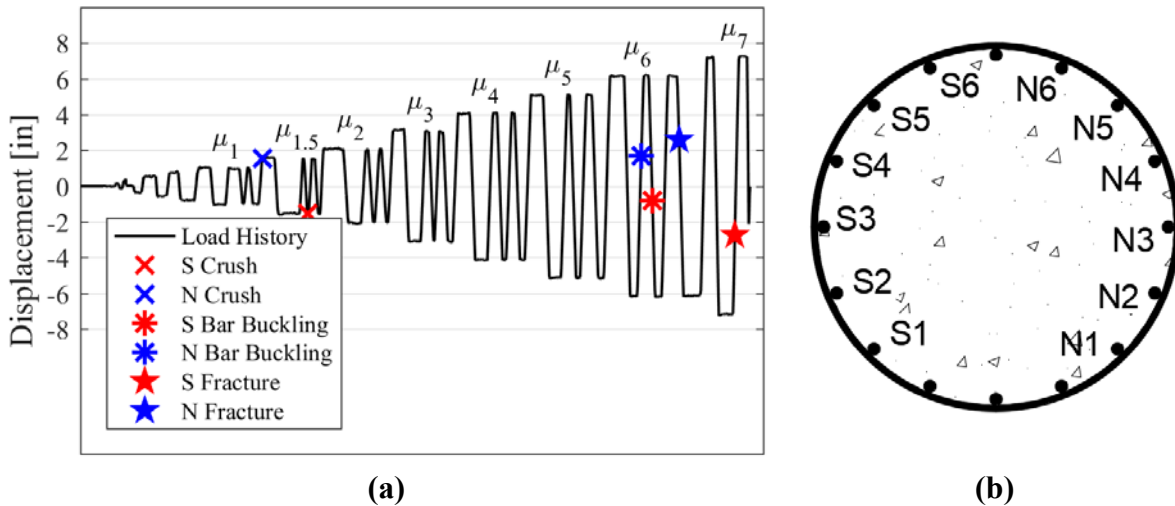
(a) Column test 4 load history. (b) Column test 4 bar labels
